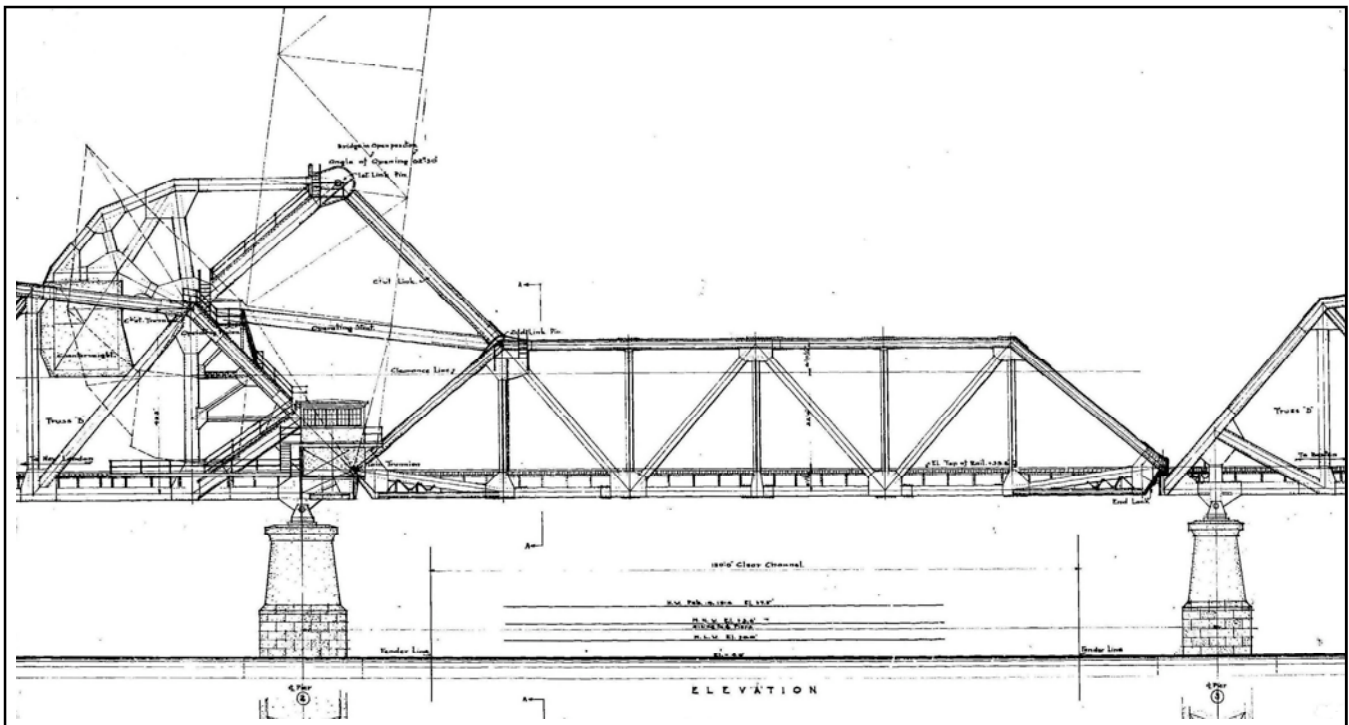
Elevation of the Strauss trunnion bascule span, Groton Bridge (Strauss Bascule Bridge Company, Strauss Trunnion Bascule Bridge over Thames River at New London, Conn. General Drawing, Sheet No. 1, June 14, 1916. On file, Amtrak Engineering Archives, Philadelphia, PA).
